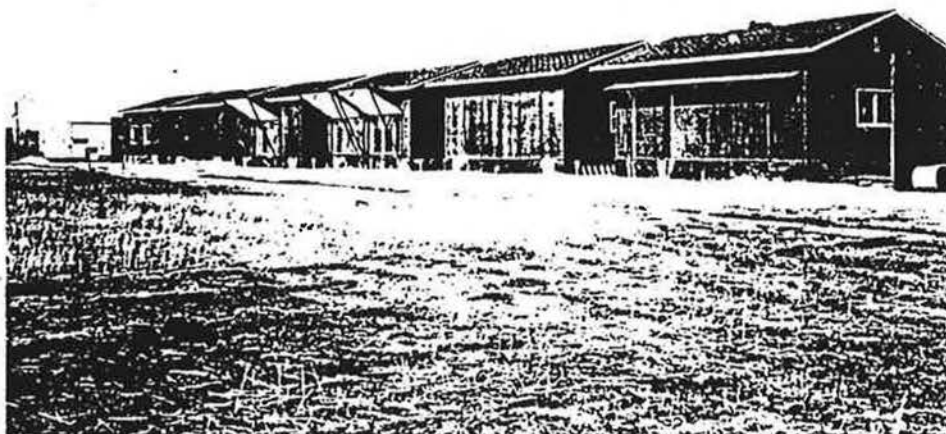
Houses 5 and 6 at AHHRF showing building orientation and false end wall.
